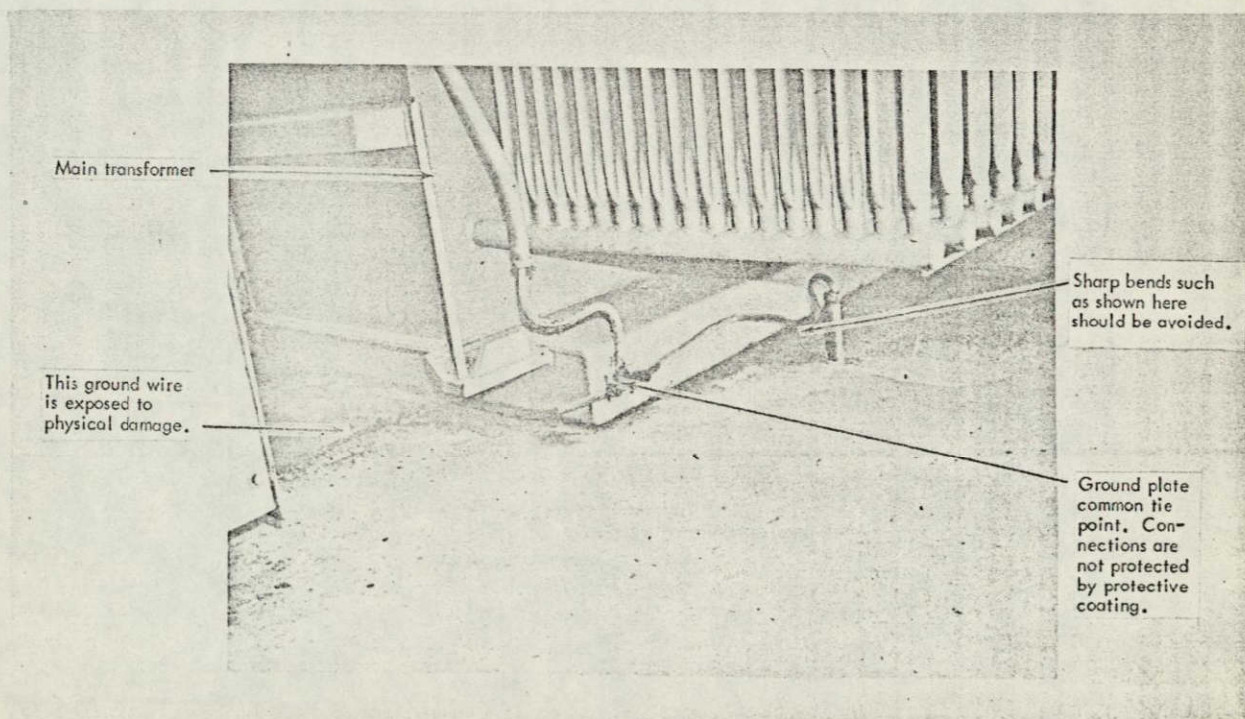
Typical Substation Power Ground (S/S 816). Note unprotected junction.
